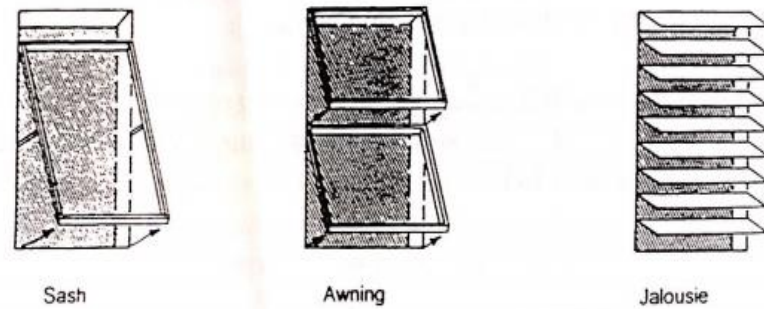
Horizontal-vane opening windows. Source: [1]
